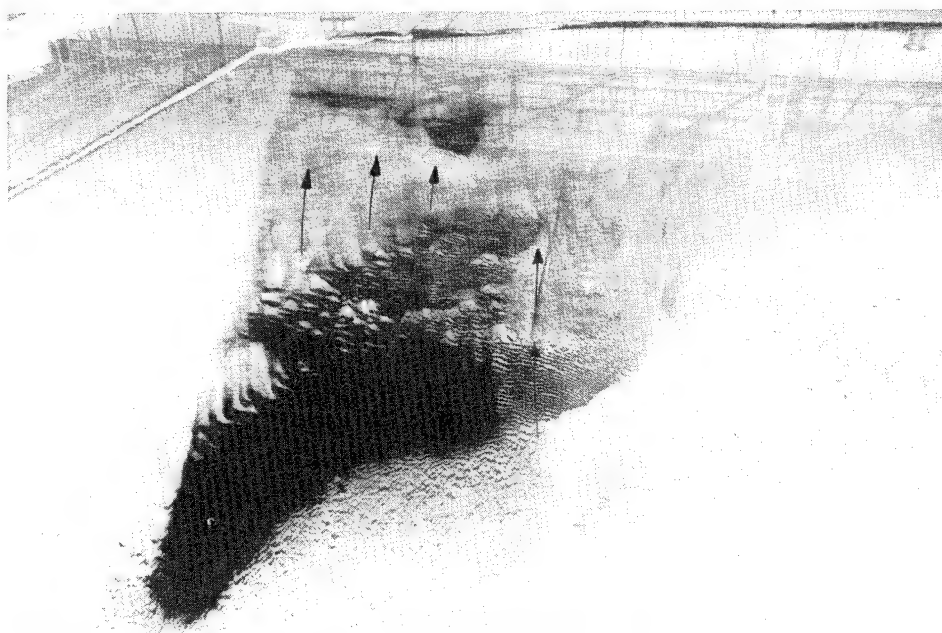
Movement of Plan 5 submerged offshore berm after 8 hr of testing;
